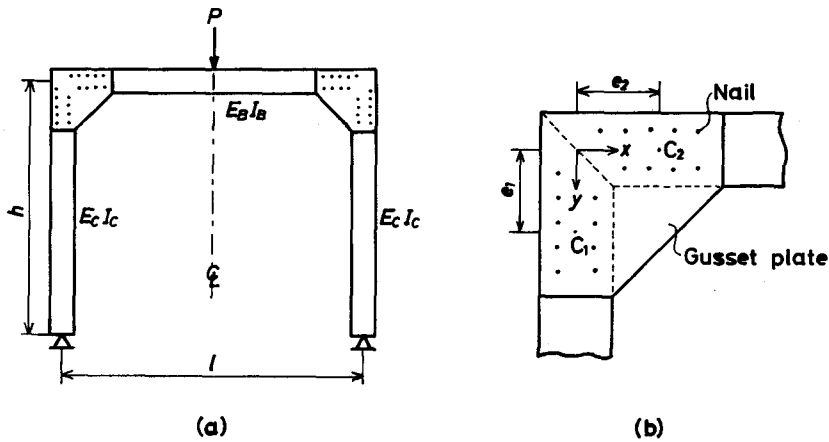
Wooden portal-frame with nailed gusset-plate corner-joints.
